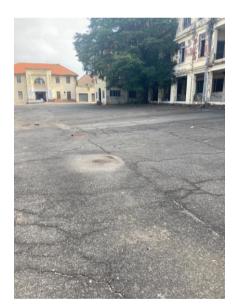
Showing deterioration and 'crocodile cracking' to asphalt surfacing.
